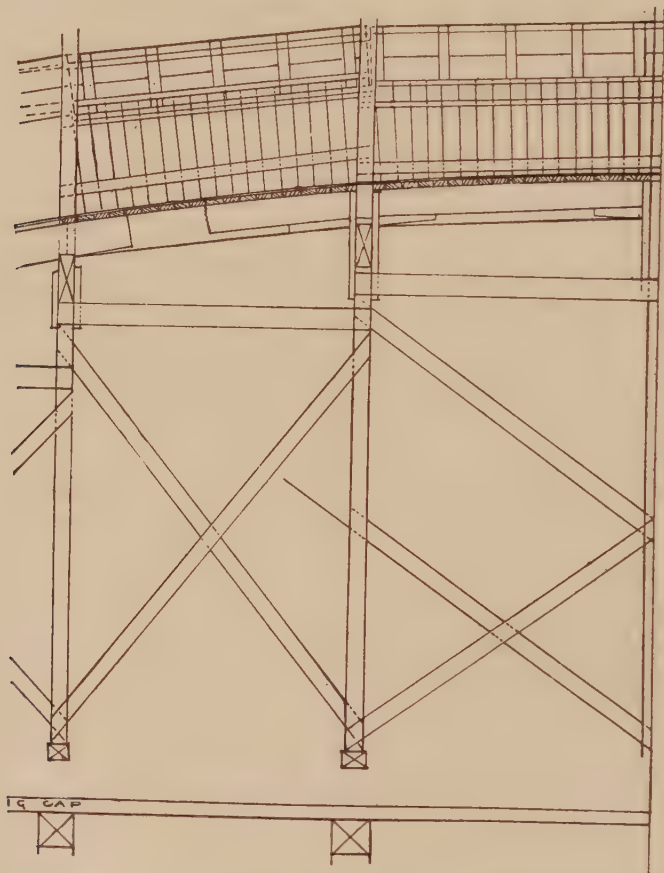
Shows portion of half side elevation of arch ring centering for one of the 122 ft. spans of the Charles River Bridge—Boston Elevated Company. (See Figs. 223a, b and c for complete view.)
